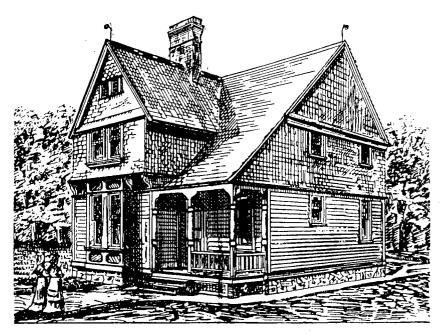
Robert Shoppell, Design 132 (Modern Low Cost Houses, 1884).
